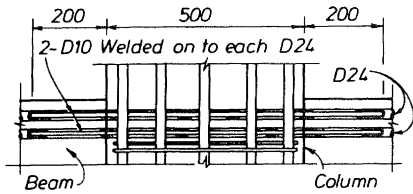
ADDITIONAL BEAM REINFORCEMENT AT AN INTERIOR COLUMN TO ENSURE THAT YIELDING OF BEAM BARS WILL NOT OCCUR WITHIN BEAM-COLUMN JOINTS [6]
